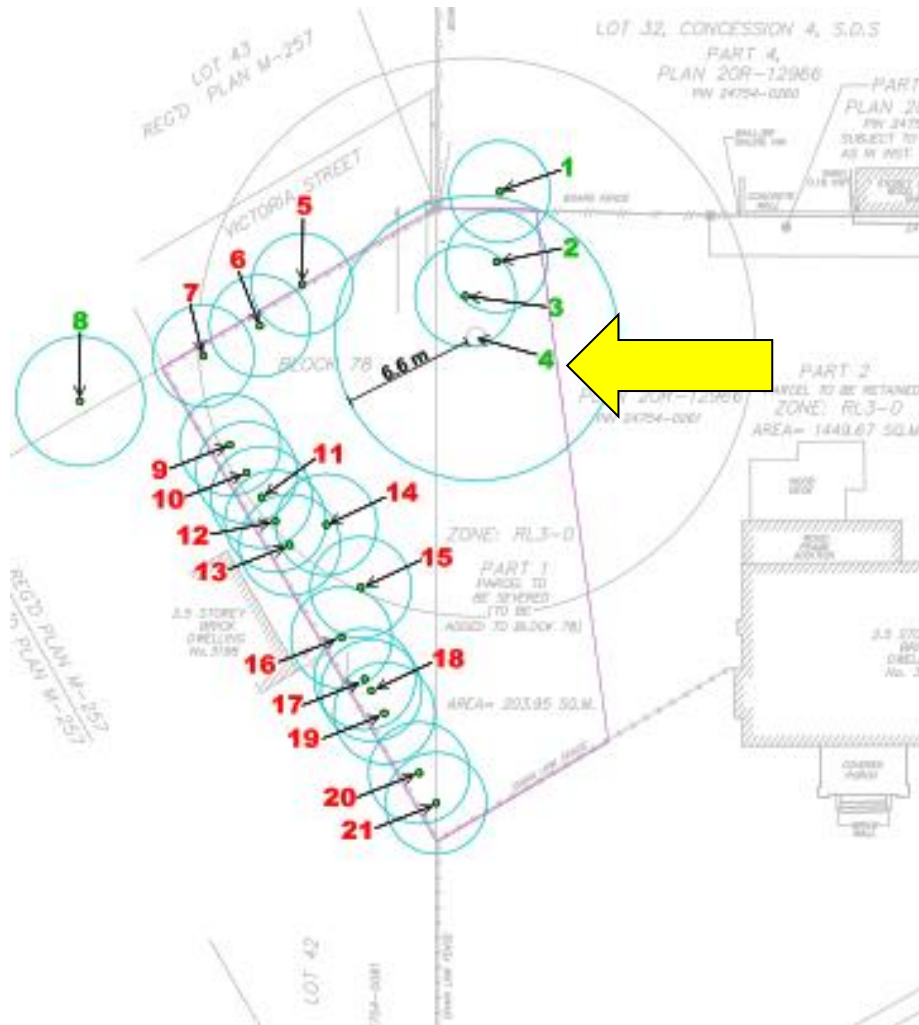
Tree Preservation Plan Excerpt from Arborist Report
